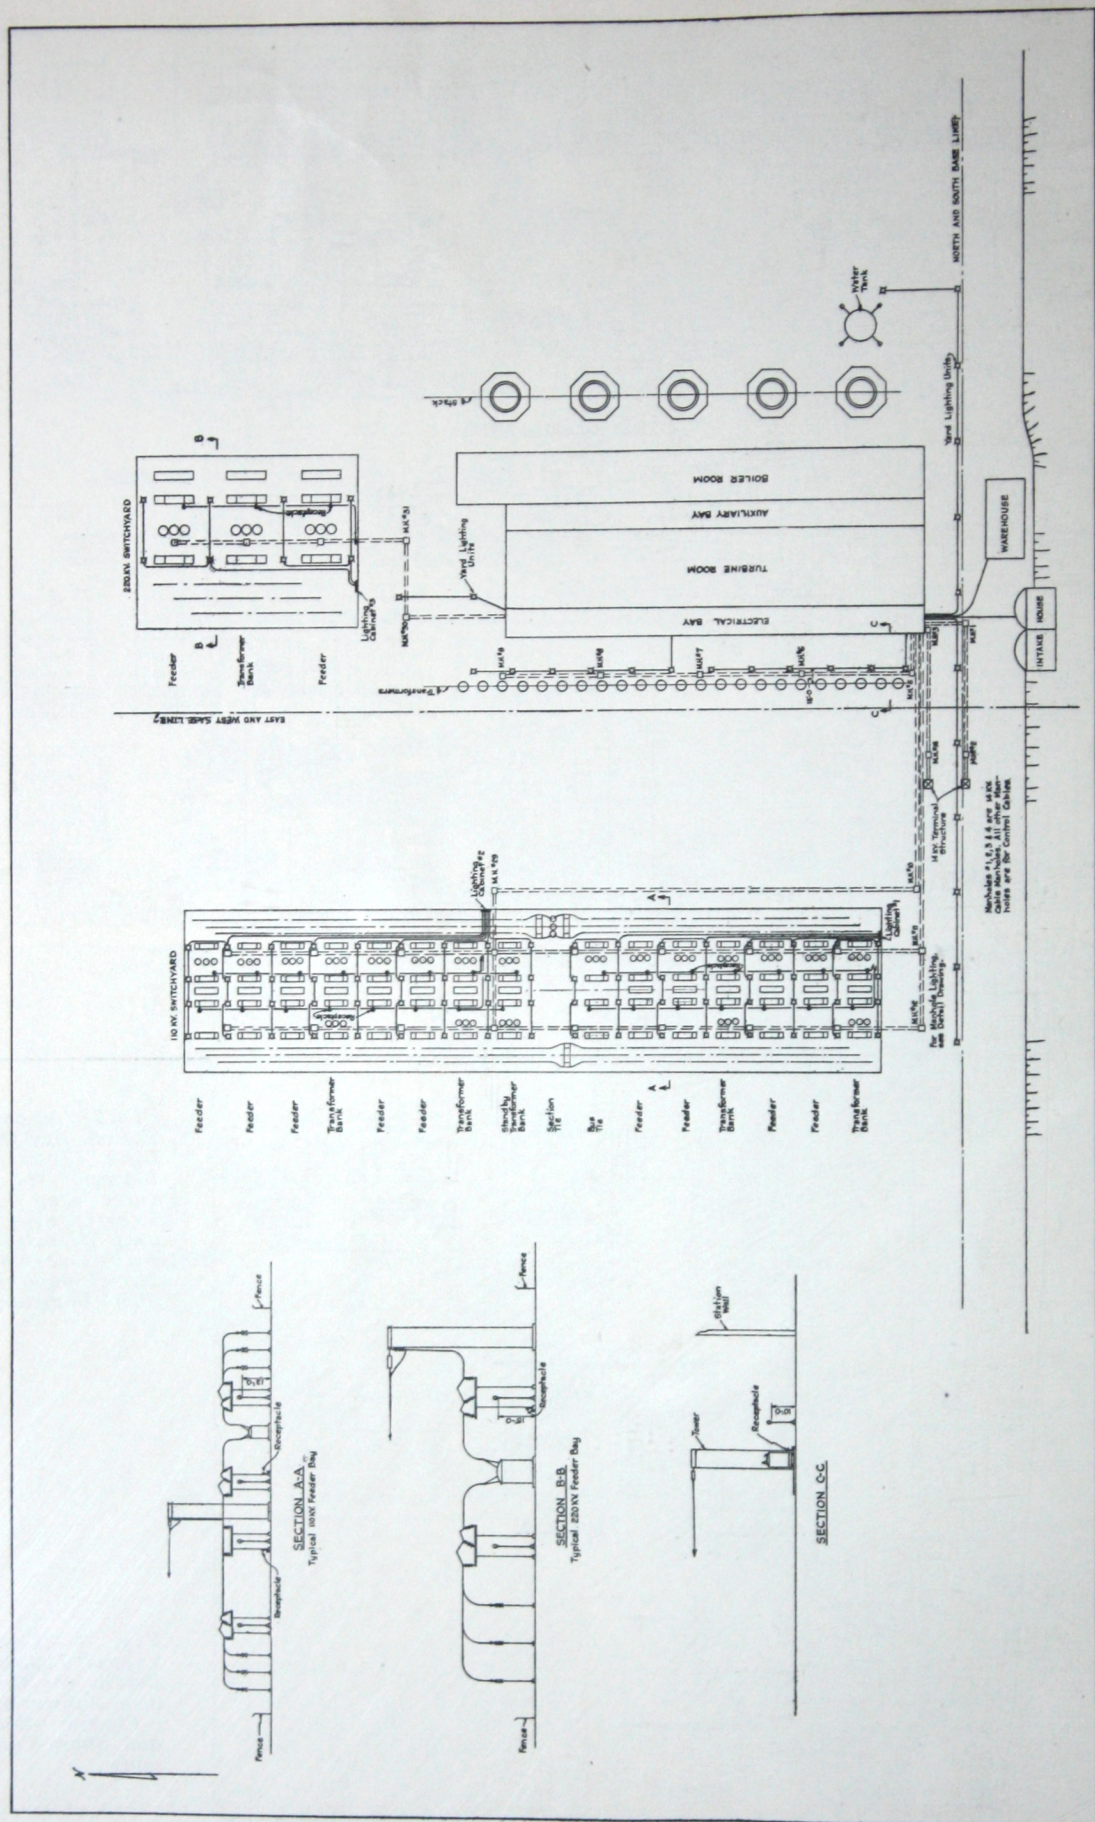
Typical Key Lighting Plan and Sections for a Large Step-up Transforming and Switching Substation—Electric Bond & Share Company
